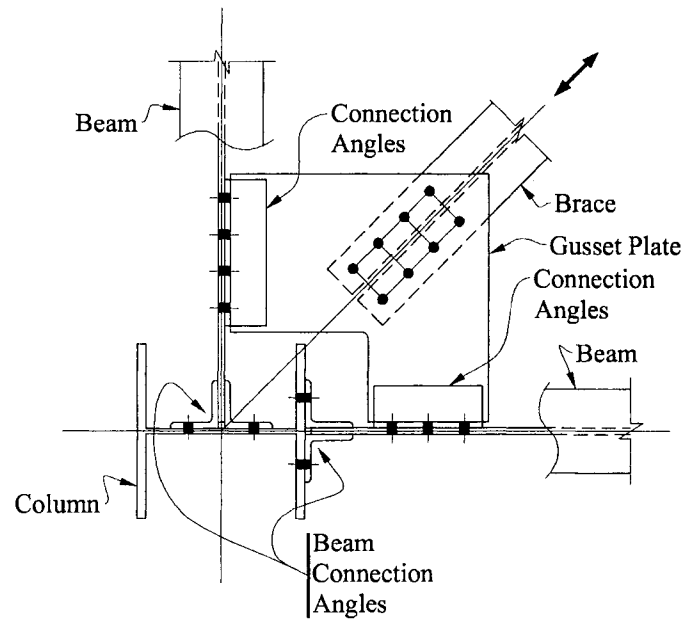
Horizontal brace connection at beam-to-column intersection.
